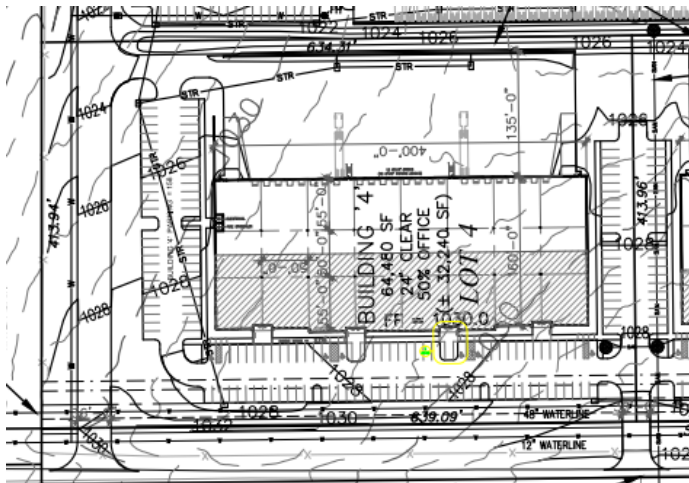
View of the subject site from the approved preliminary plan, PL14-02P.
